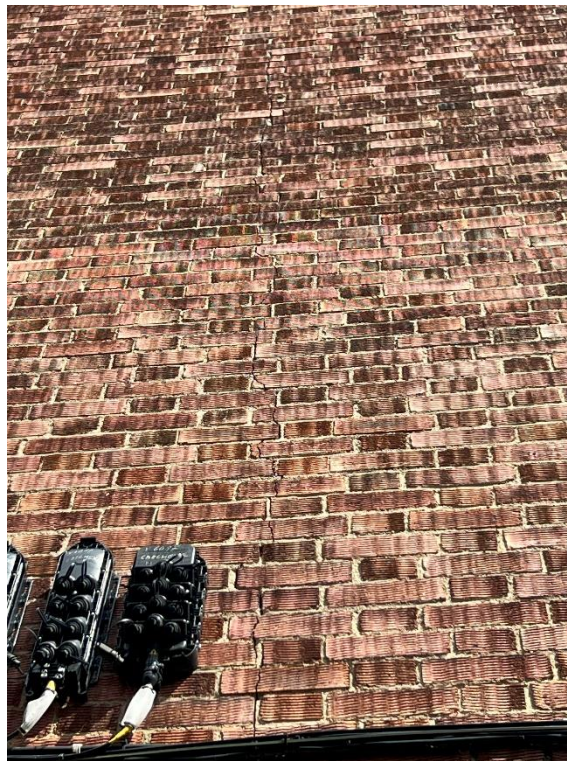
Close-up on brickwork cracks in various locations
